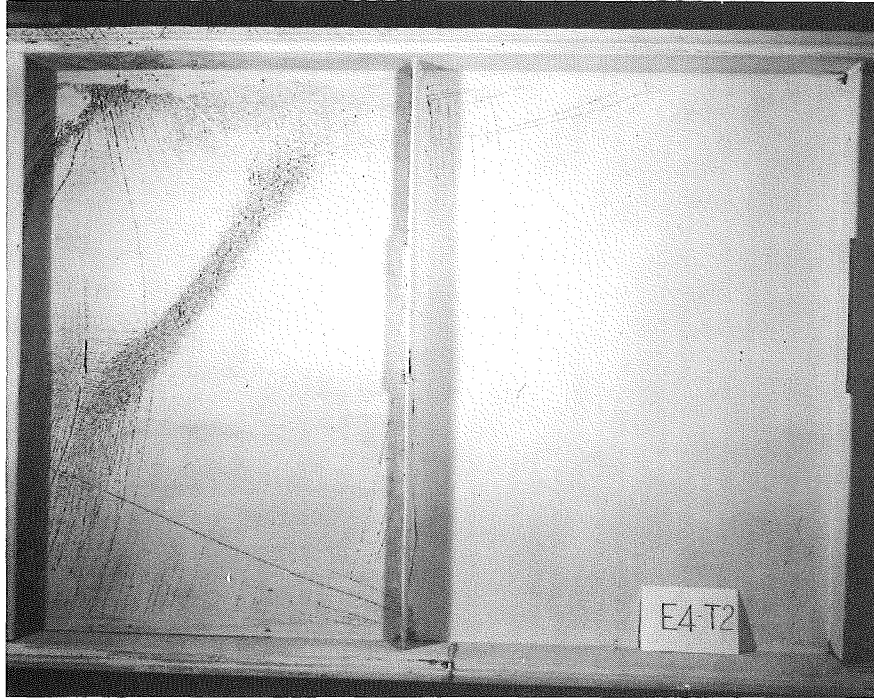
Failure of Girder E4 in Test T2, Near Side
